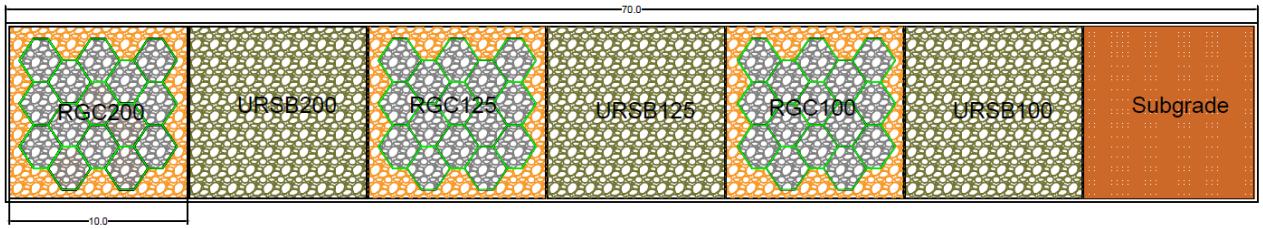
Test Section, Pavement Section of Geocell-Reinforced at Testing Site.
